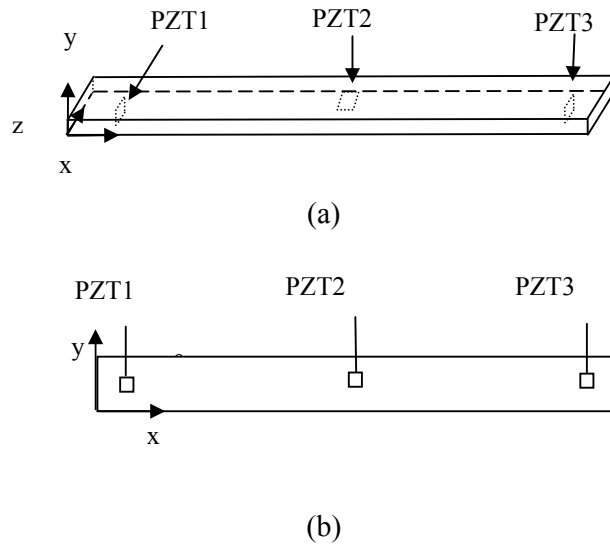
(a) Concrete specimen (b) Top view of the concrete specimen
